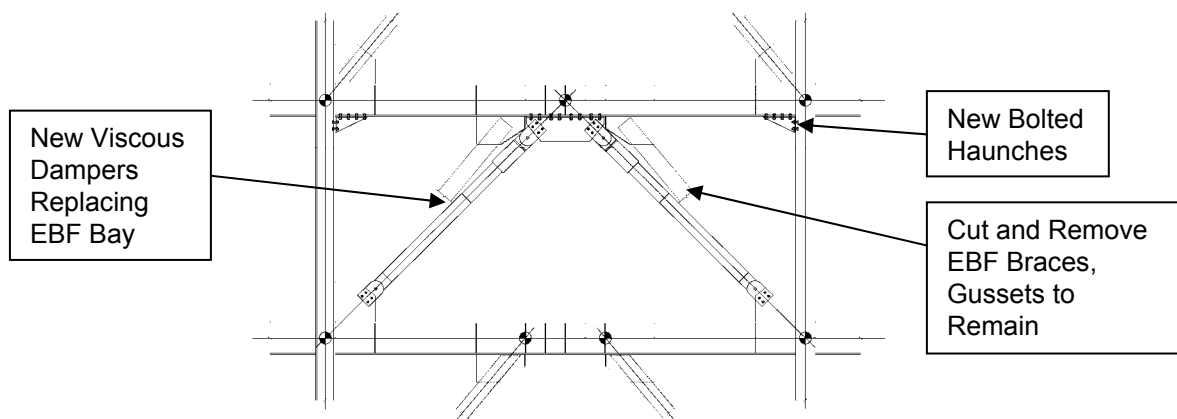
Typical elevation of EBF frame retrofit with viscous dampers
